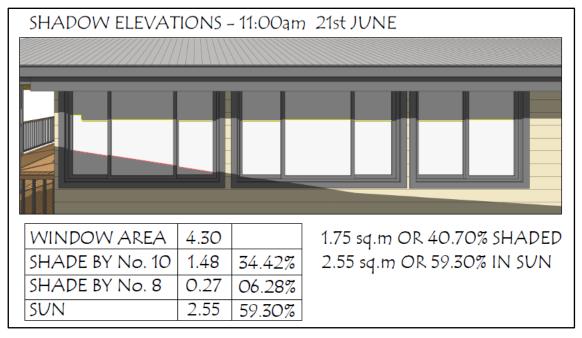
Revised shadow elevations for 10 Admiralty Crescent at 11 am
